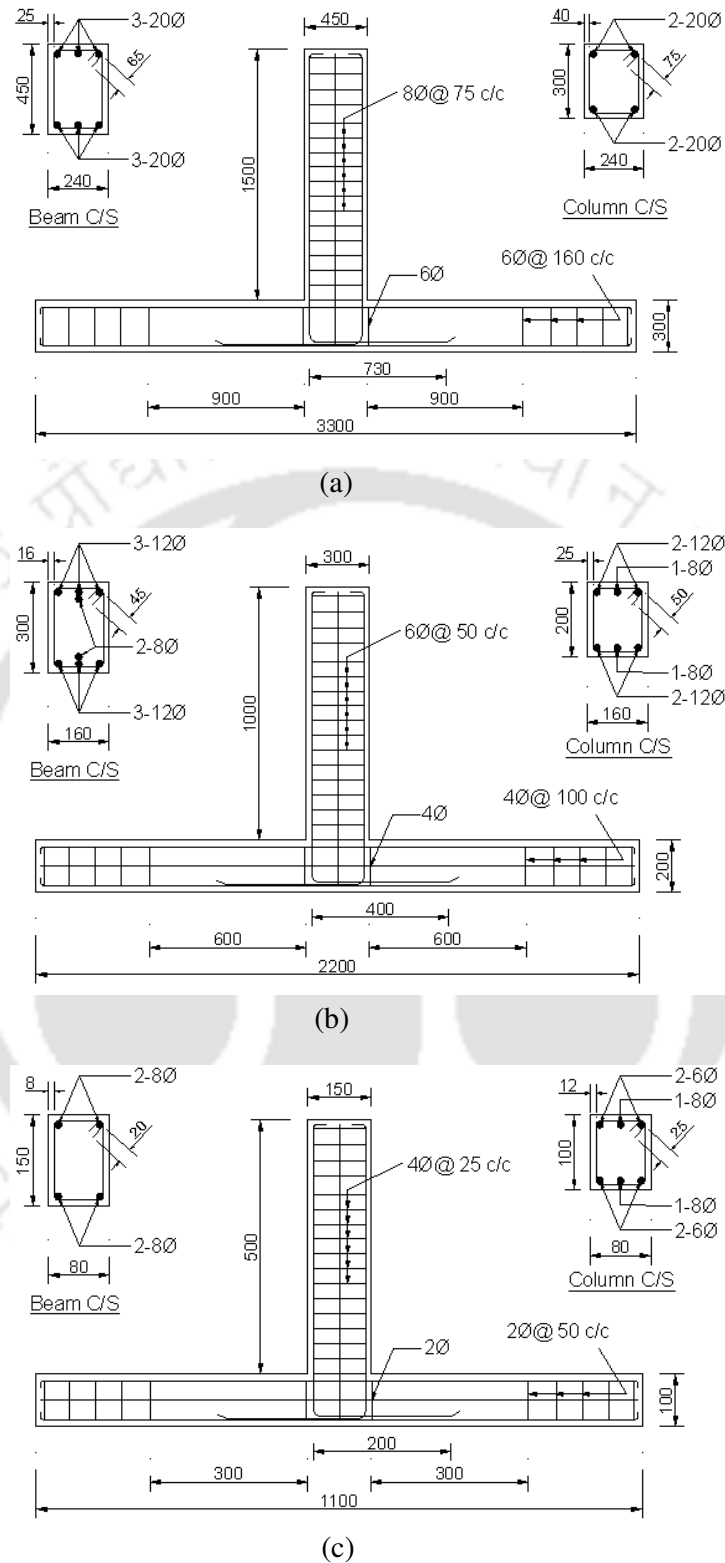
Reinforcement details of column weak in shear: control specimens (a) Full scaled (CWSLC) (b) Two-third scaled (CWSMC) and (c) One-third scaled (CWSSC)
